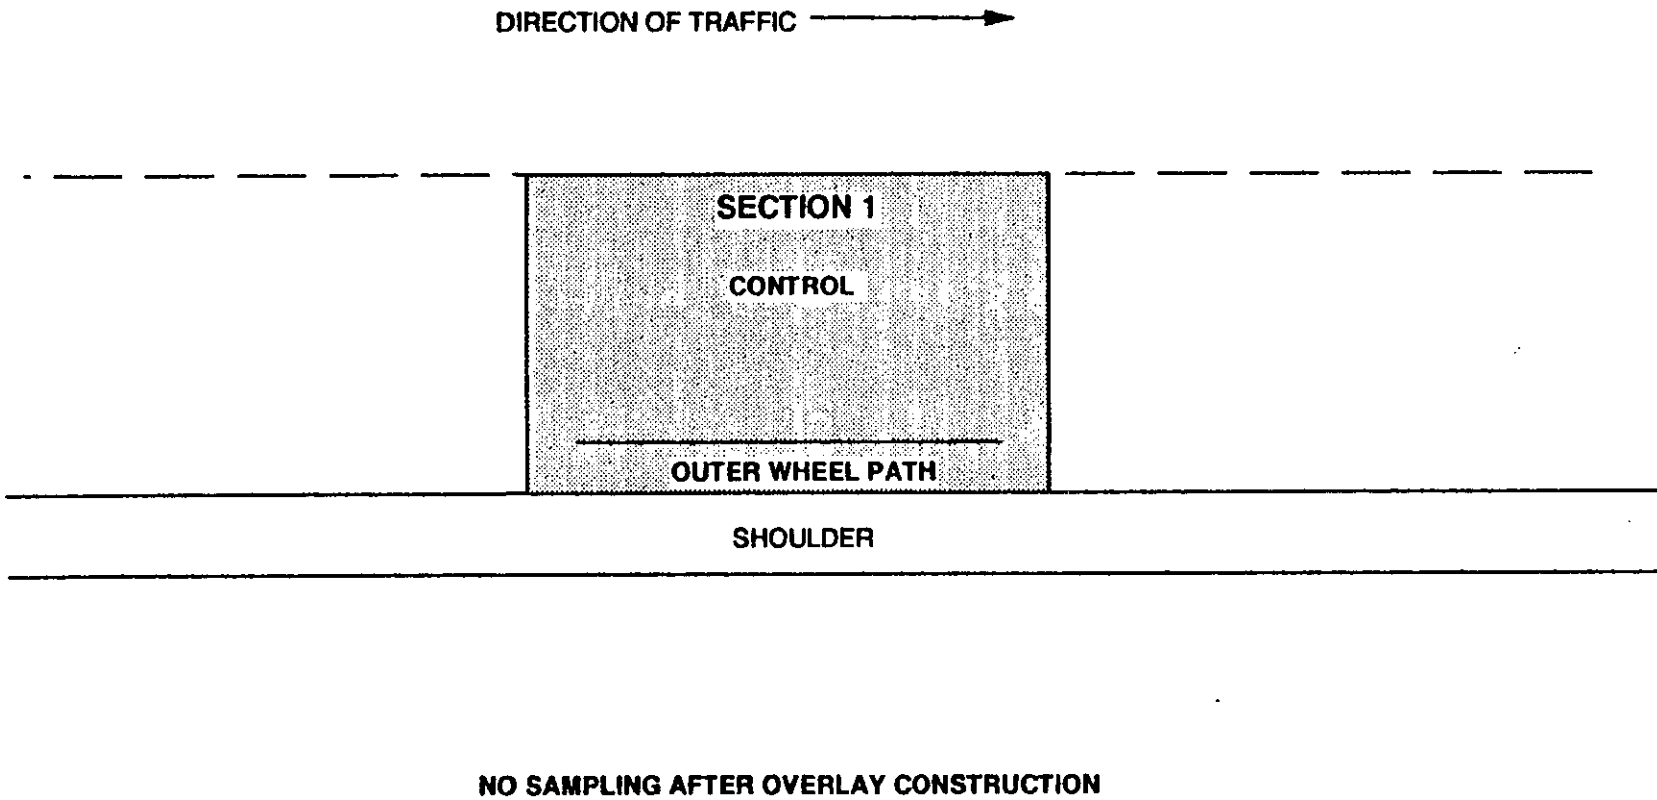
Example of "Post-Construction" Sampling Plan for Section 1
